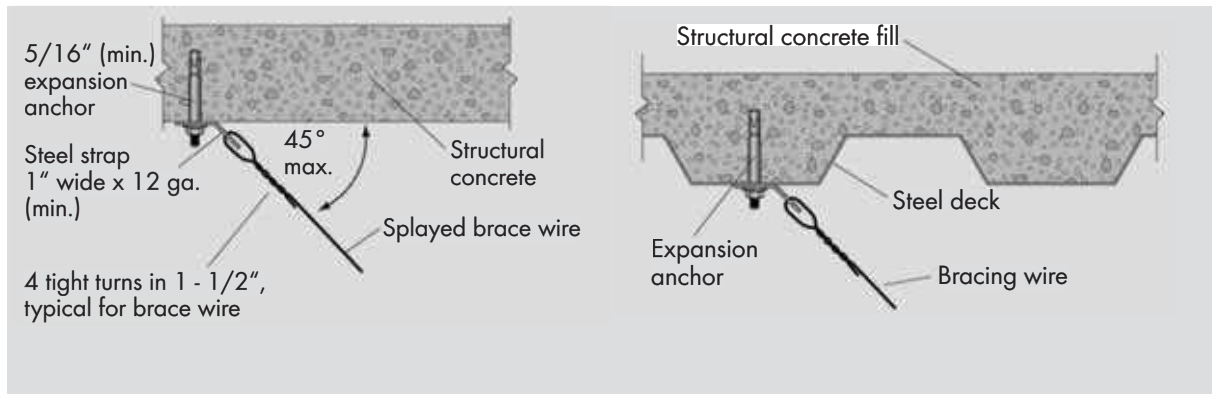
Overhead attachment details of the diagonal wire braces
